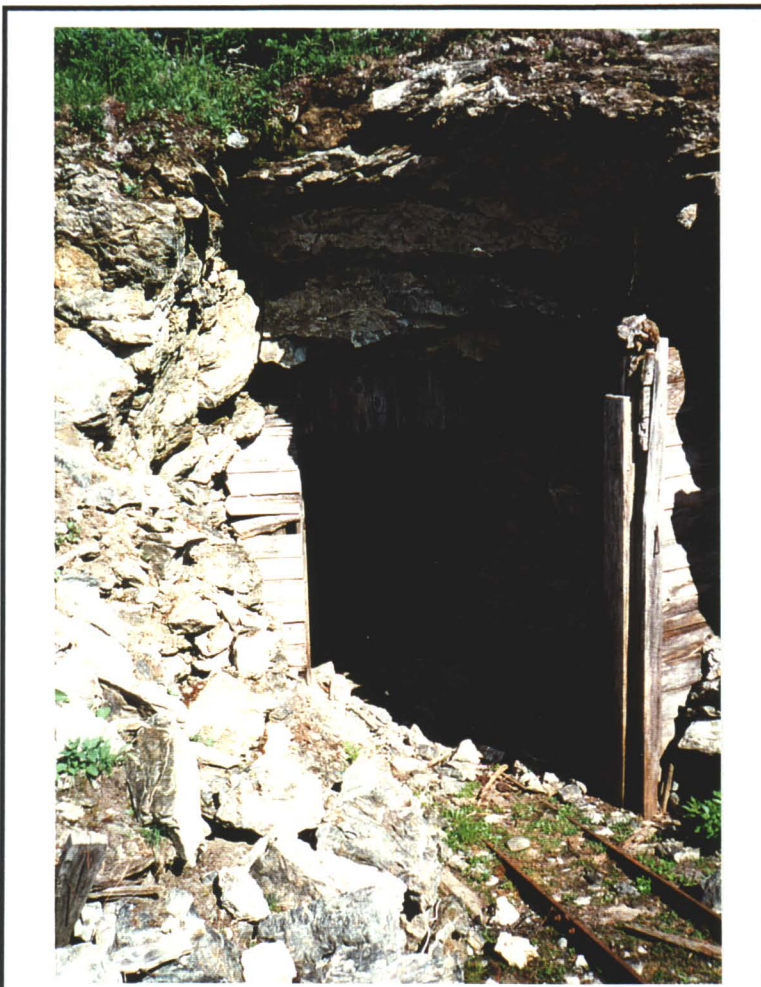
Uncovered adit entrance with wood frame, overburden and track. Note risk of collapse of overhead rock.
